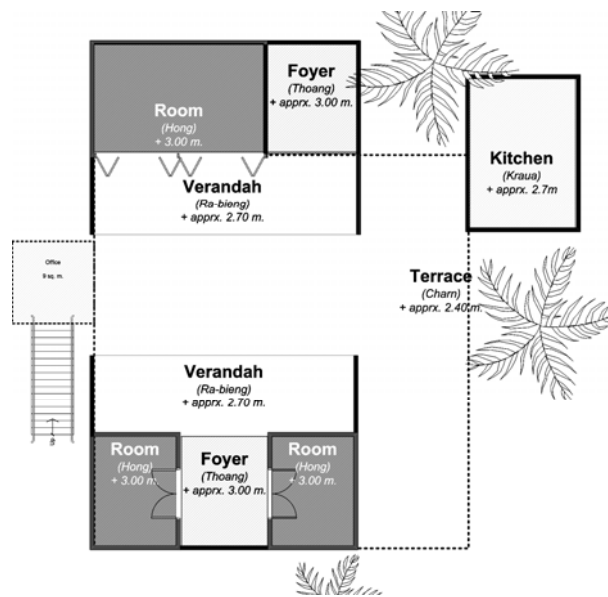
Diagram showing a typical floor plan of an extended dwelling
